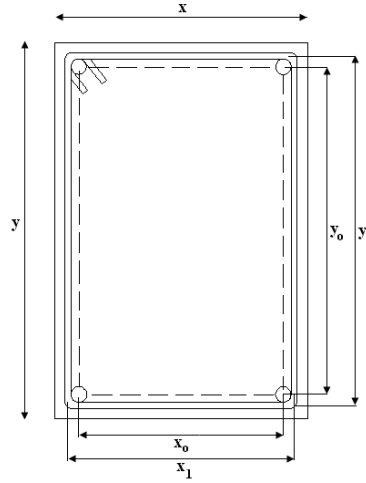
3 The cross section of a rectangular reinforced concrete beam
